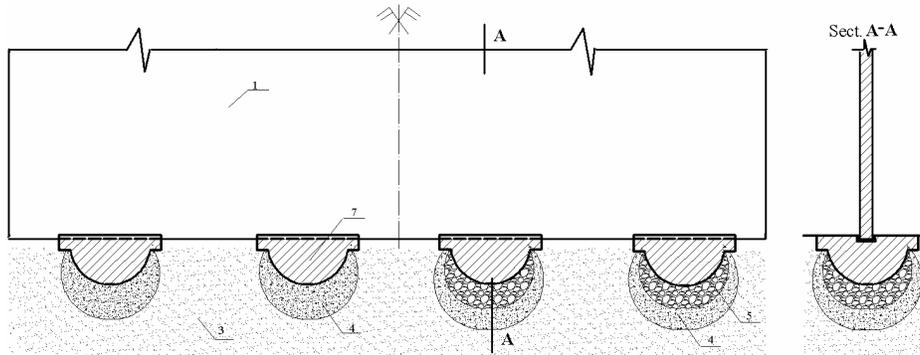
Semi-sphere punched foundations used in discontinuous foundations under walls (1 - wall, 3 - natural soil, 4 - improved soil, 5 - bulb, 7 - semi-sphere with anti-pressing plate)
